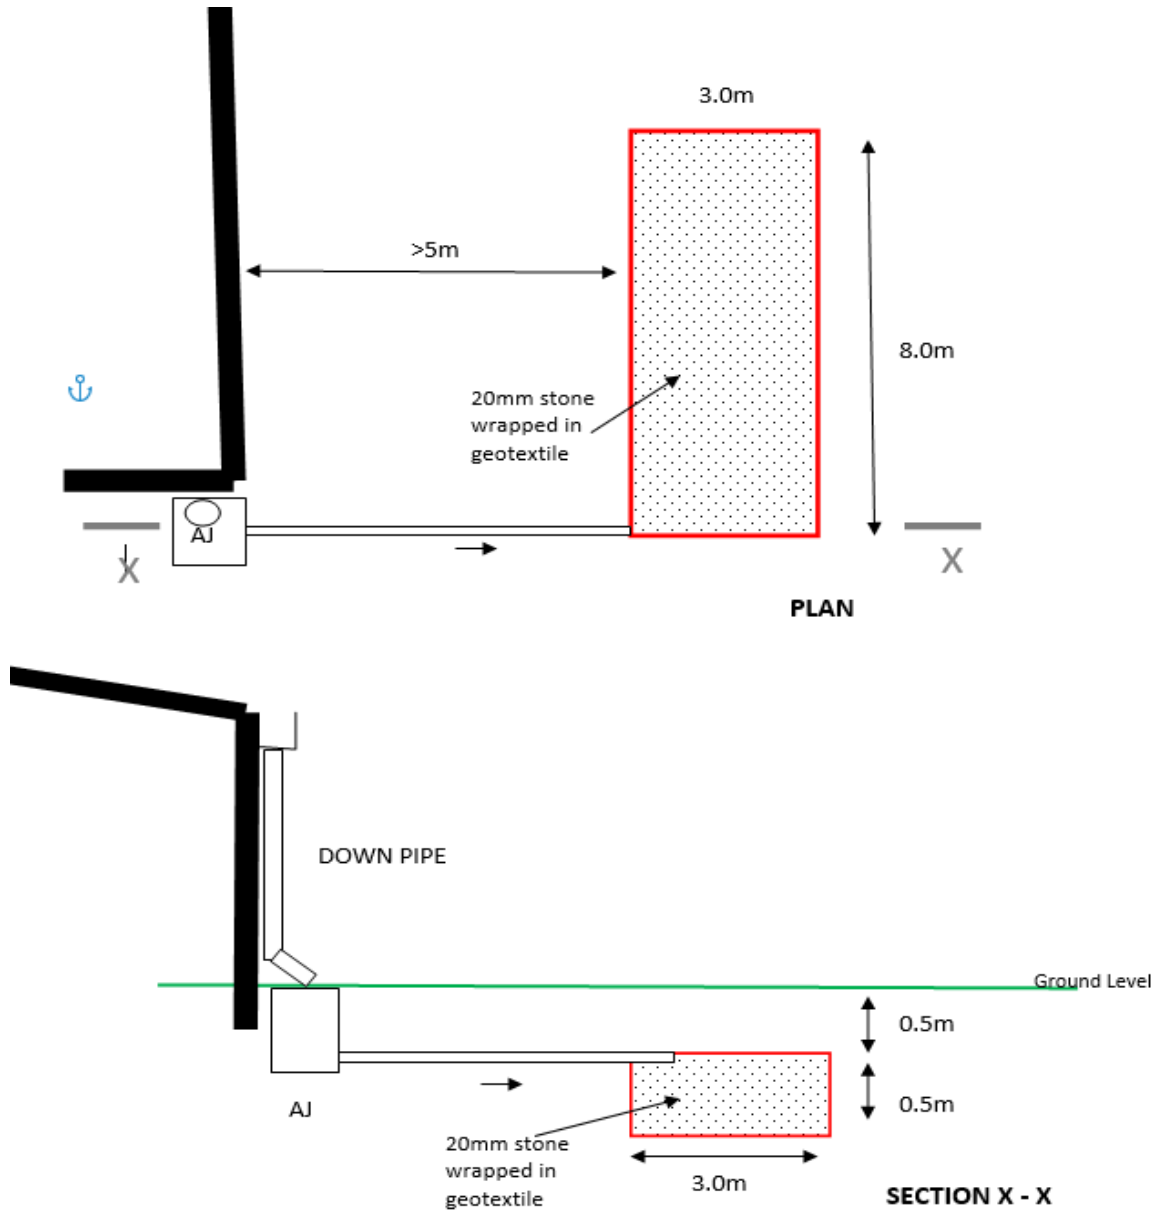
Proposed Soakage Trench Details (Schematic)
